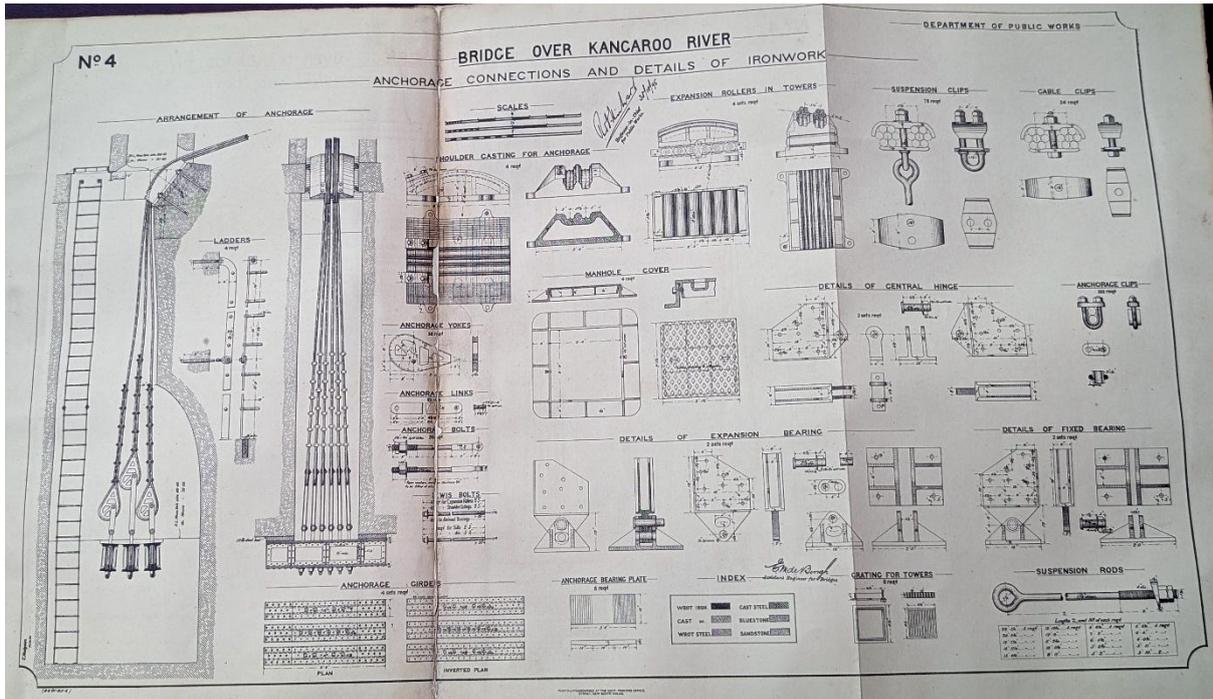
Anchorage Connections and Details of Ironwork, 1895 (Mitchell Library, Q624.23/1 – Sheet No. 4) Dovetailed anchorage girders cut 24 ft into solid rock, expansion rollers in towers, suspension clips – the “umbrella spokes” of 1897
